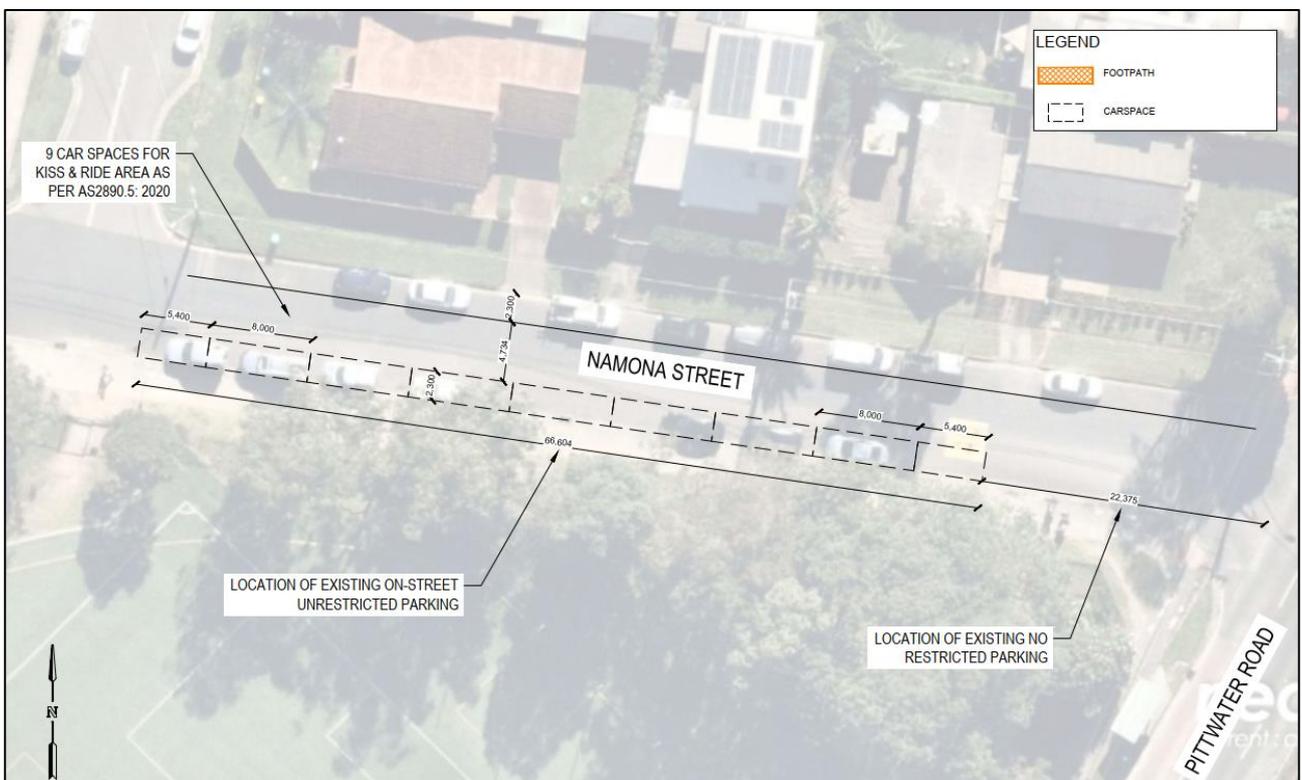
Proposed Kiss and Ride Facility on Namoma Street
